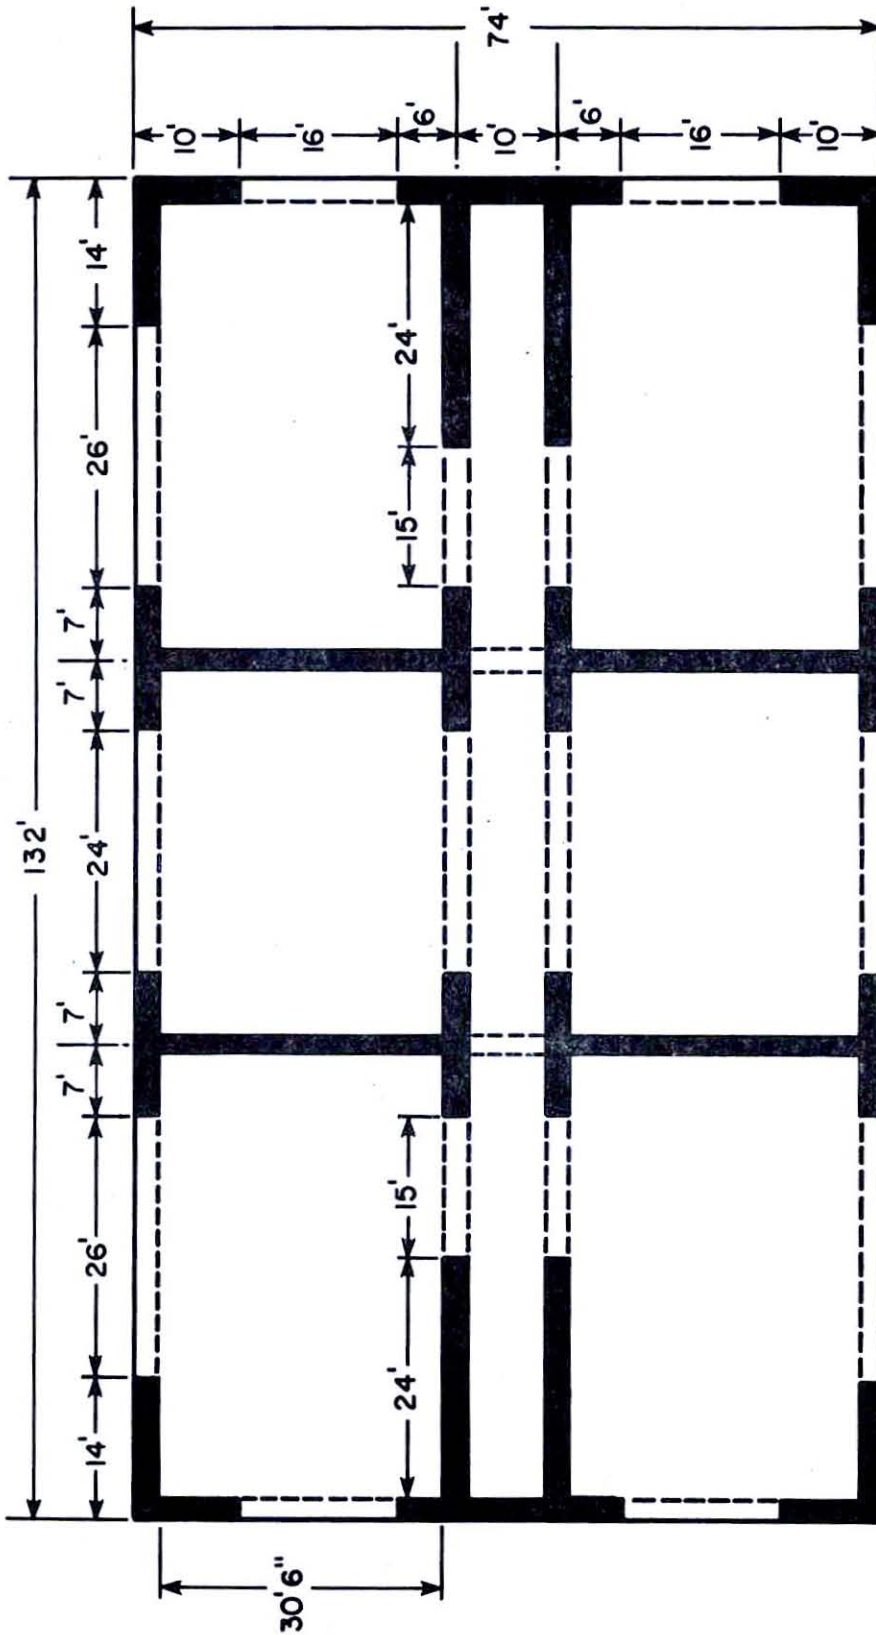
FLOOR PLAN OF THE BUILDINGS
